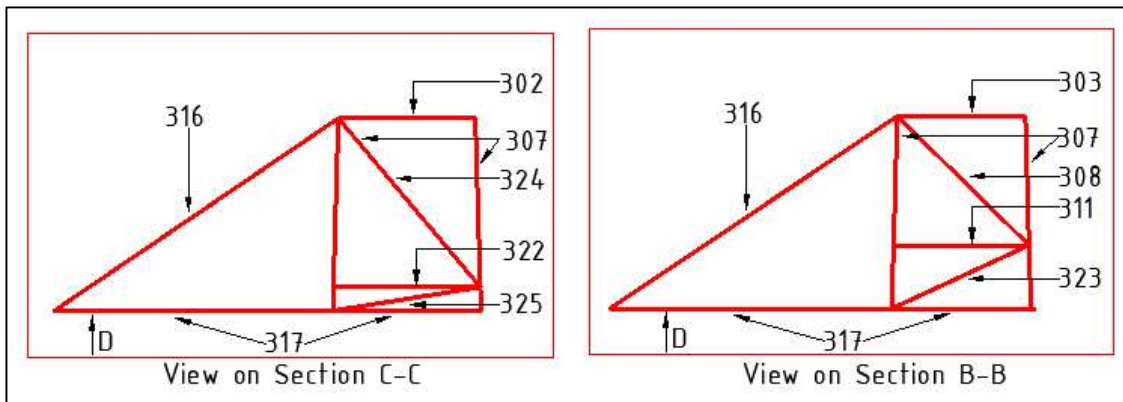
Internal bracing arrangements for the extension frame on the upper crossarm
